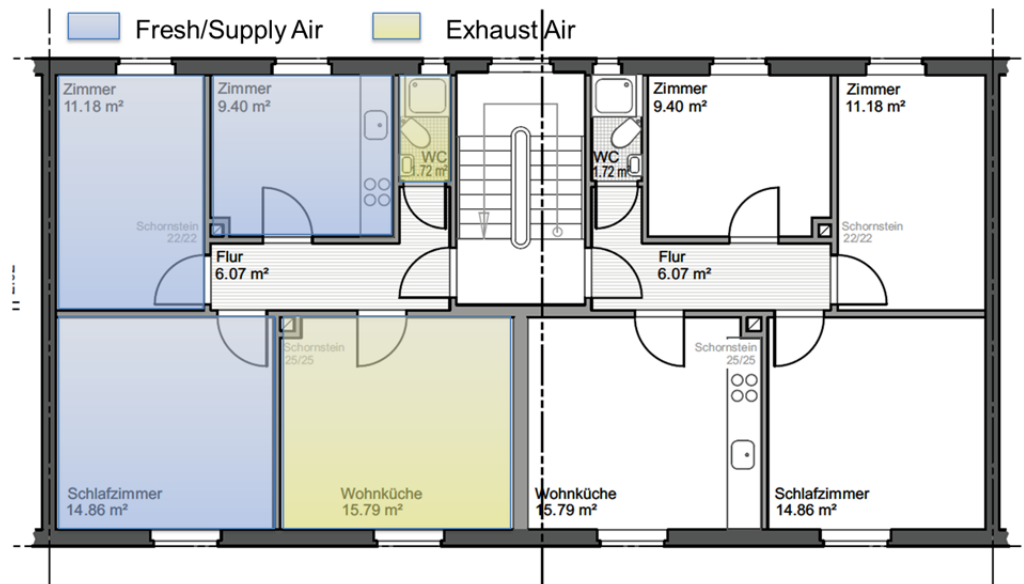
Existing floor plan with a supply and exhaust air concept.
